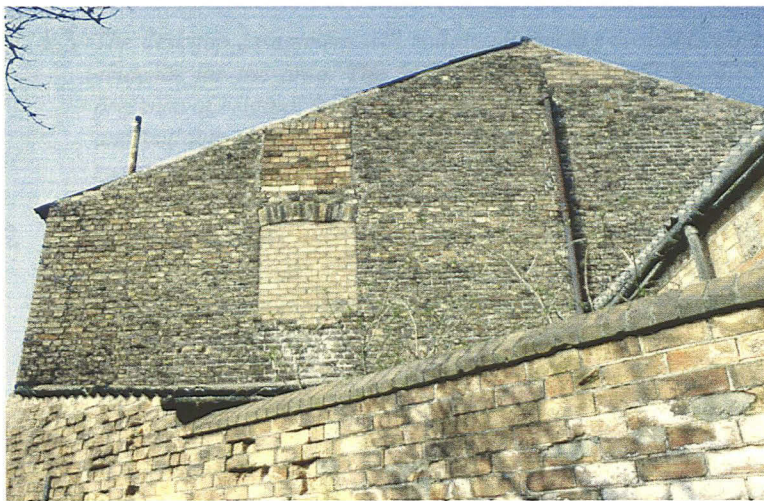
Partial view of the eastern elevation, showing blocked windows, looking west
